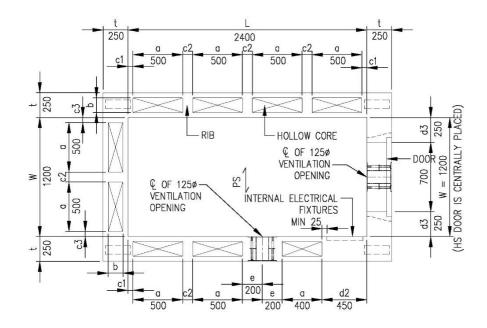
(b) PRECAST HS WITH HS DOOR ON SHORTER WALL AND ONE OF VENTILATION SLEEVE ABOVE THE DOOR (TYPE 2)
